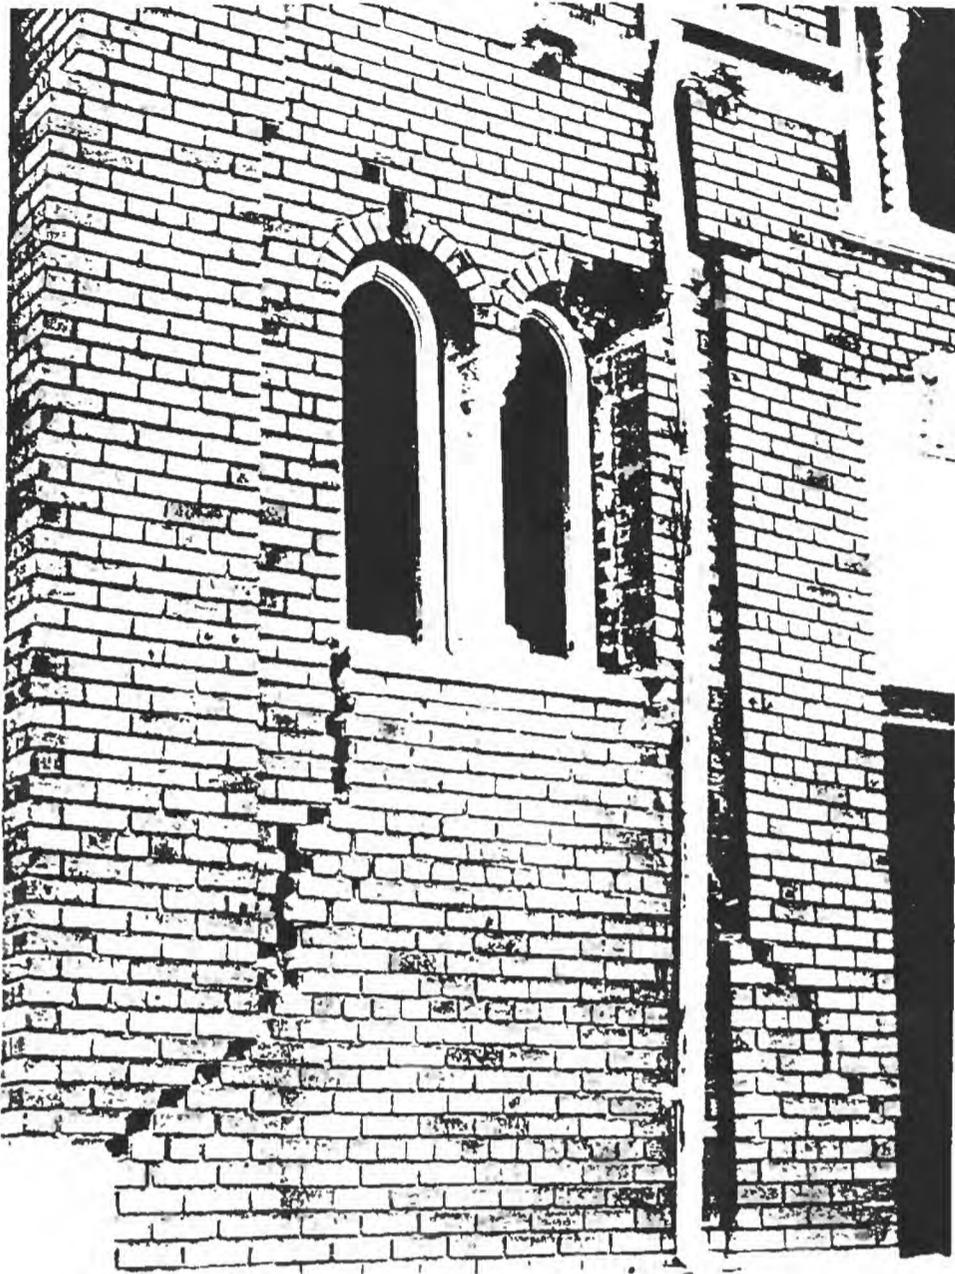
Damage to unreinforced masonry Southern Missionary Baptist church, Los Angeles (West Adams) (listed under Intensity VIII).
